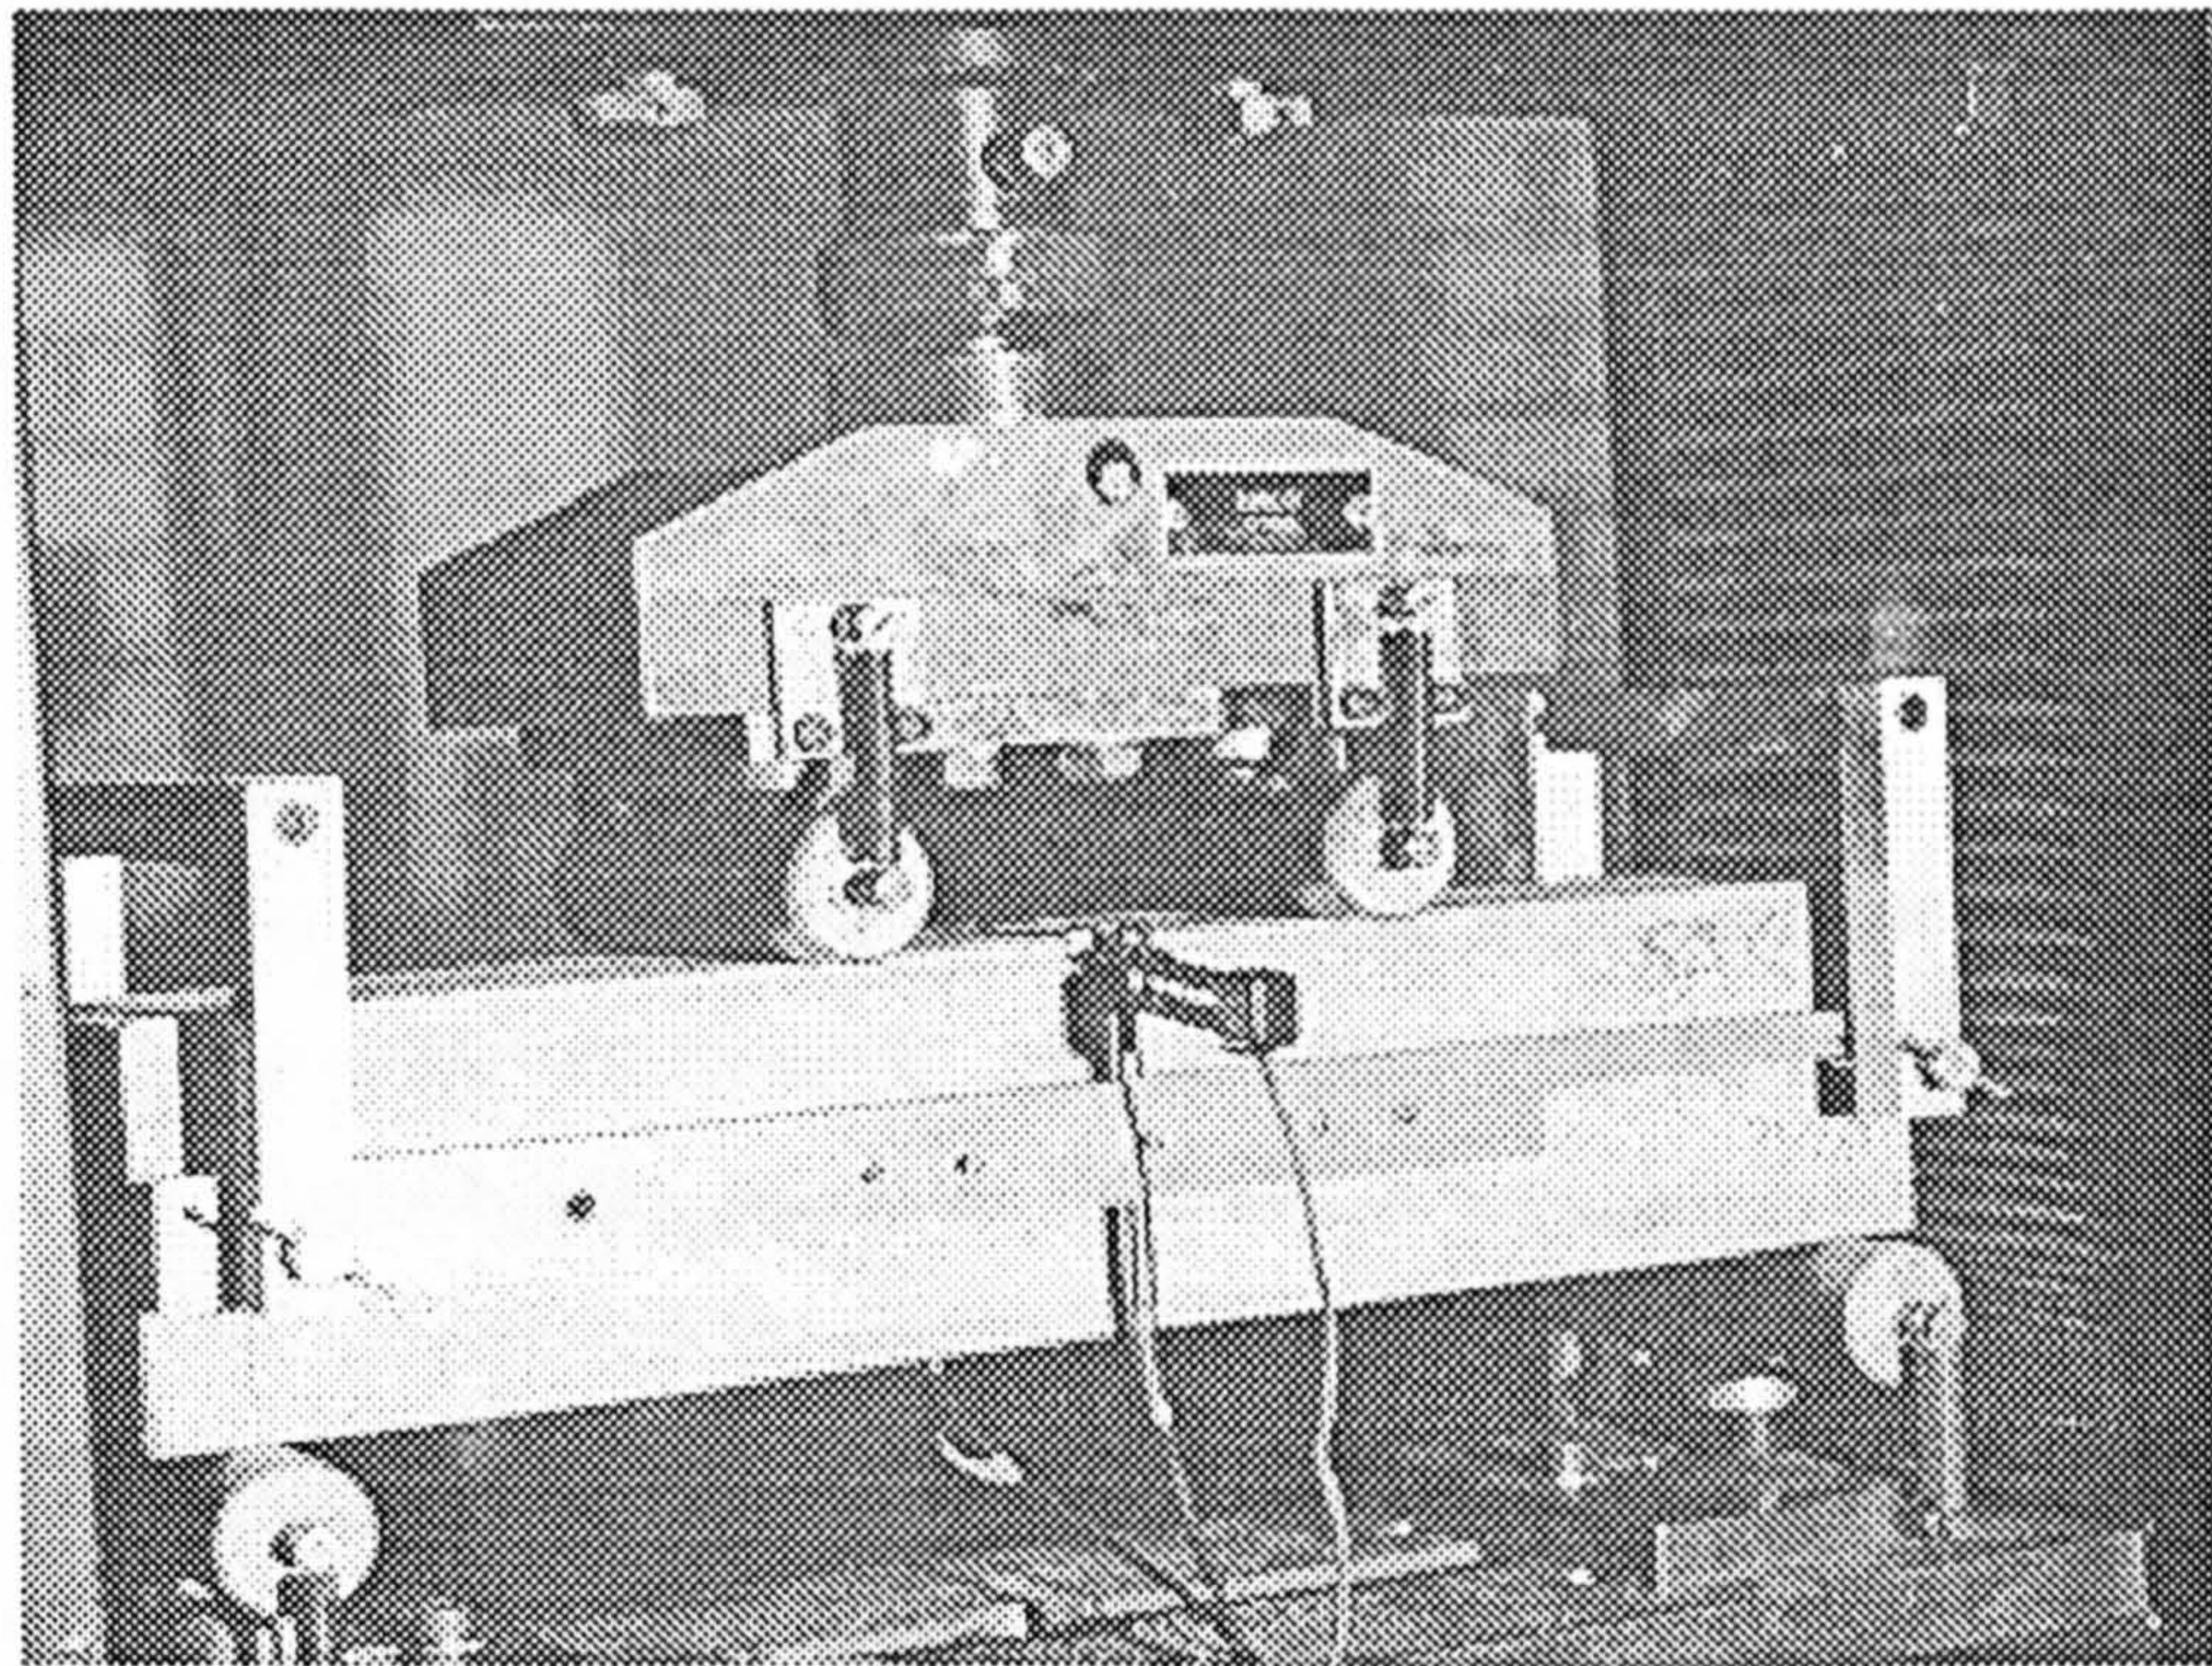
Flexural toughness specimen - rear view showing the yoke and LVDT/extensometer attachment.
